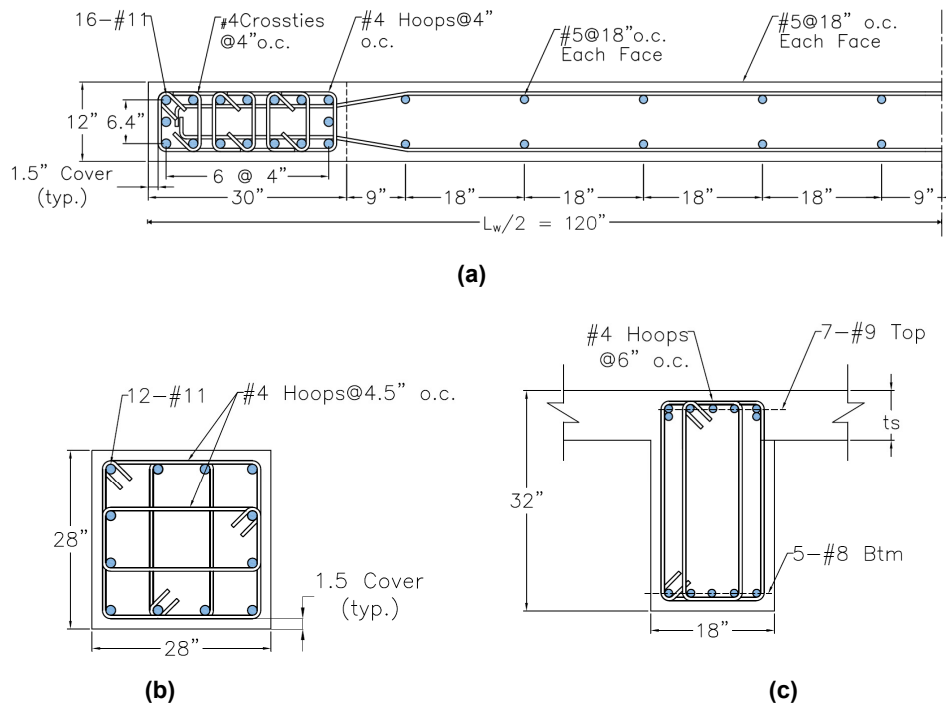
Member cross sections: (a) wall, (b) column, and (c) beam.
